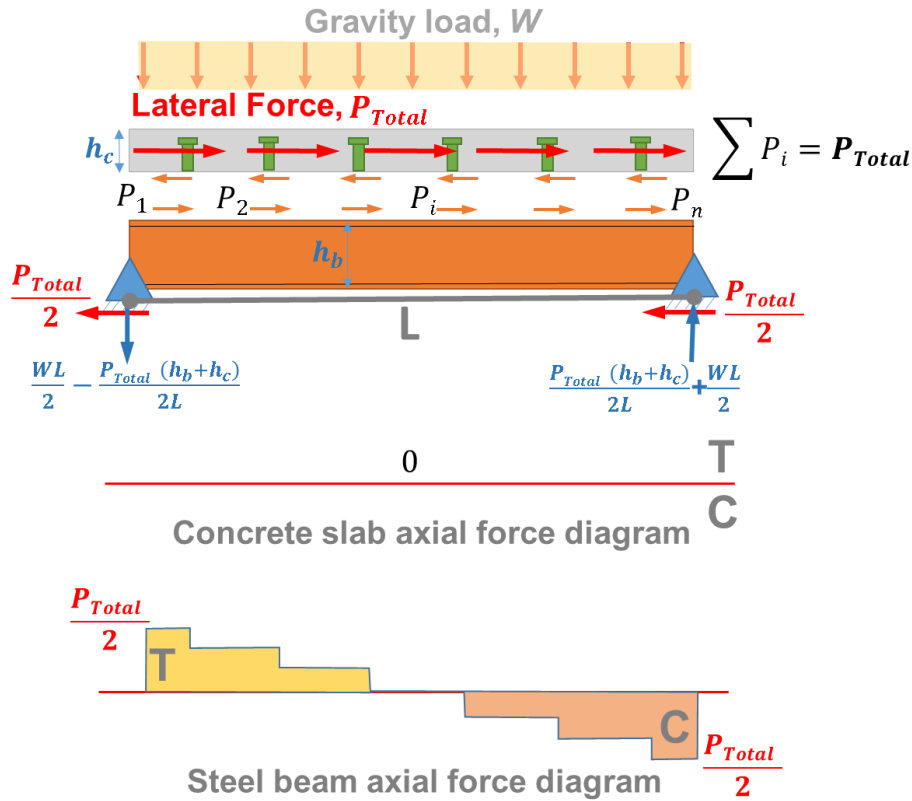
Axial force diagram of steel beam and concrete slab due to composite action and lateral forces considering the nonlinear behaviour of shear studs
